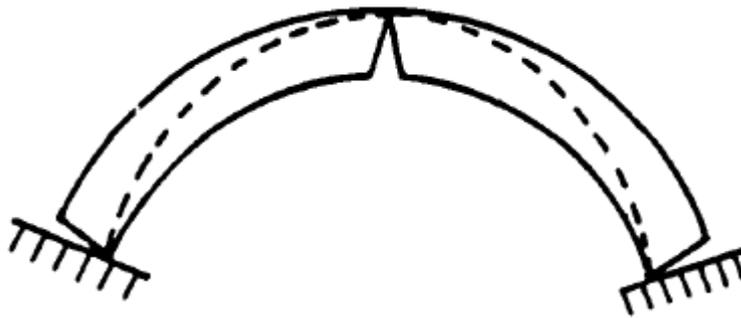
A structure will never, in practice, fit perfectly to its foundations. A masonry arch will crack if the abutments spread slightly, but will nevertheless be a perfectly satisfactory structure (Heyman 2000)
